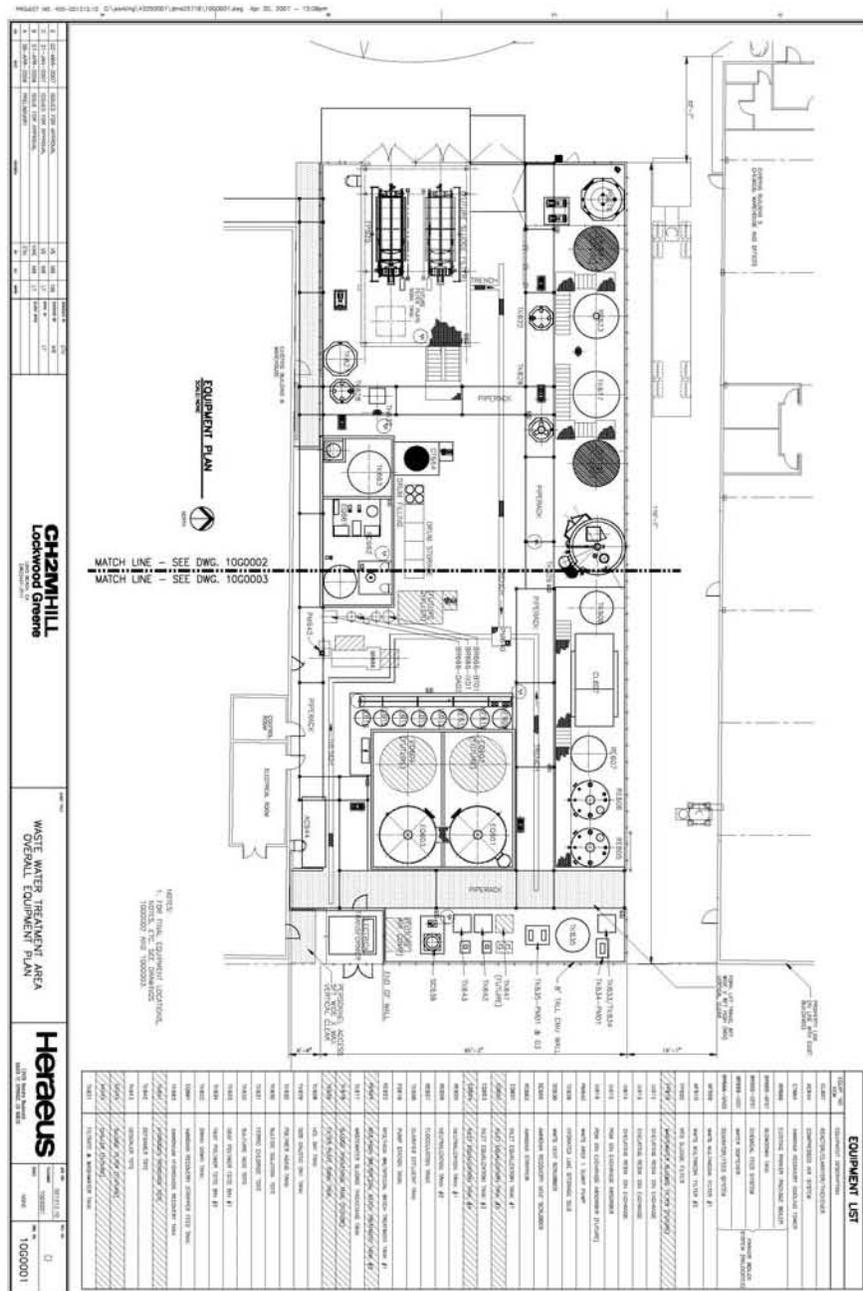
WASTEWATER TREATMENT SYSTEM LAYOUT
